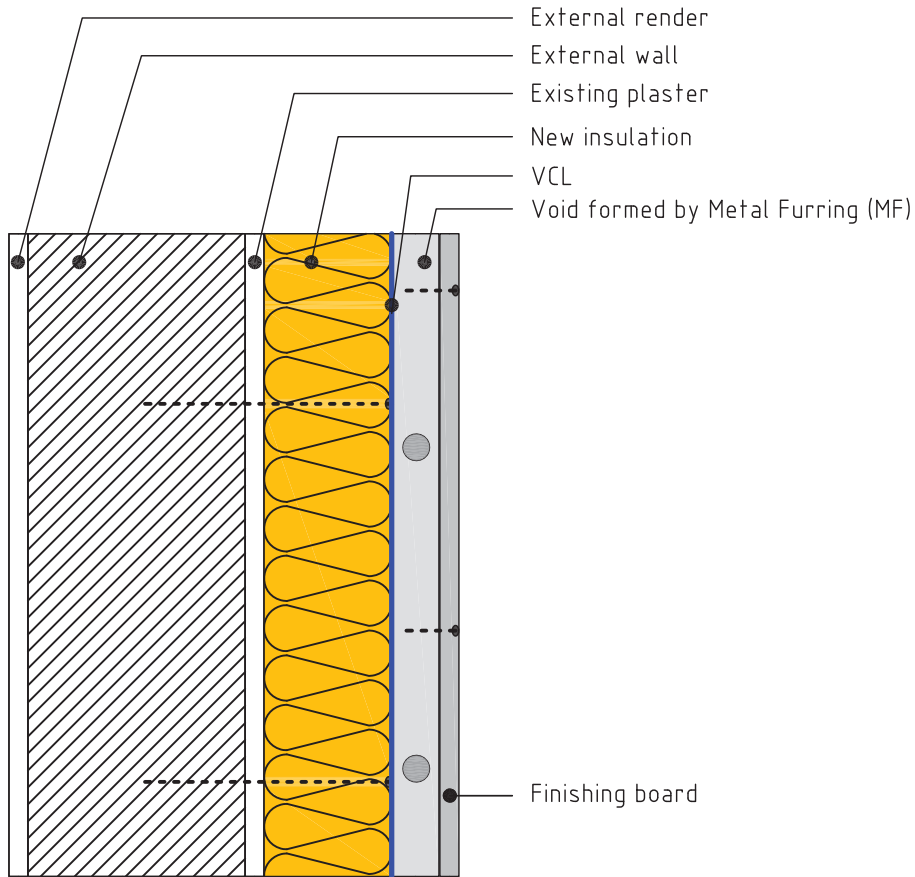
Insulation board fixed to wall with cavity formed by Metal Furring (MF)
